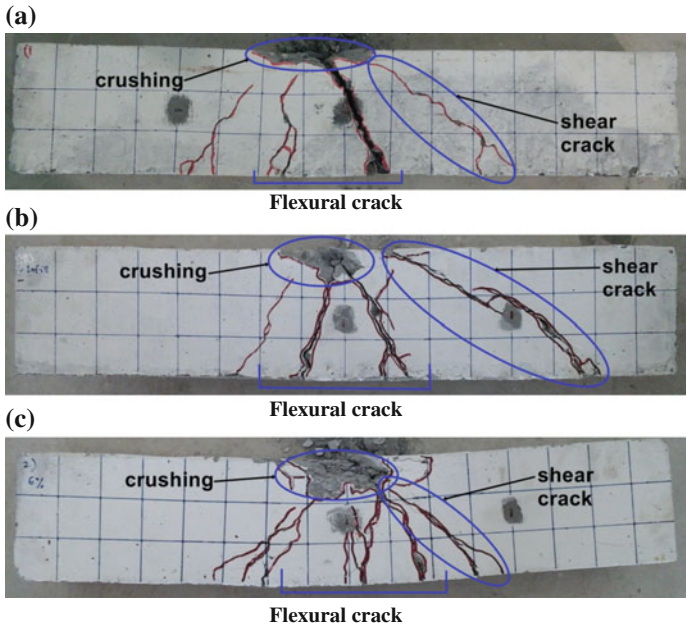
Failure and crack pattern of tested beam. a NRC, b RCAI, c RP6A
